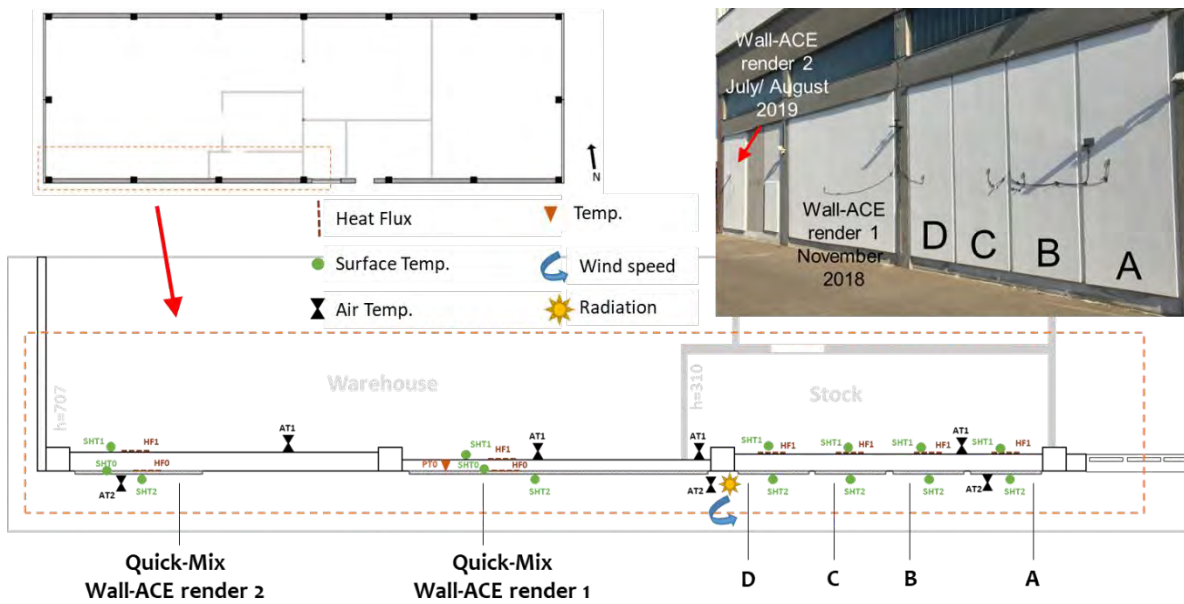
Floor plan: AGITEC storehouse. Feature test walls, sensors and installation.
